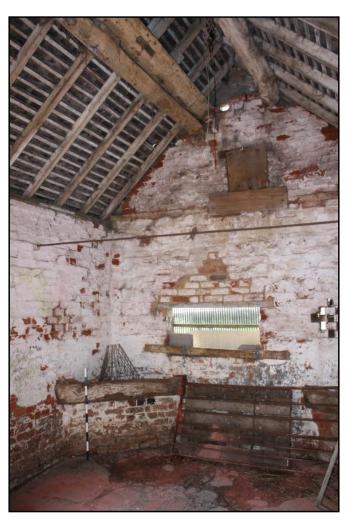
Internal view of the west room, showing corner feed trough, inserted window and roof structure.
